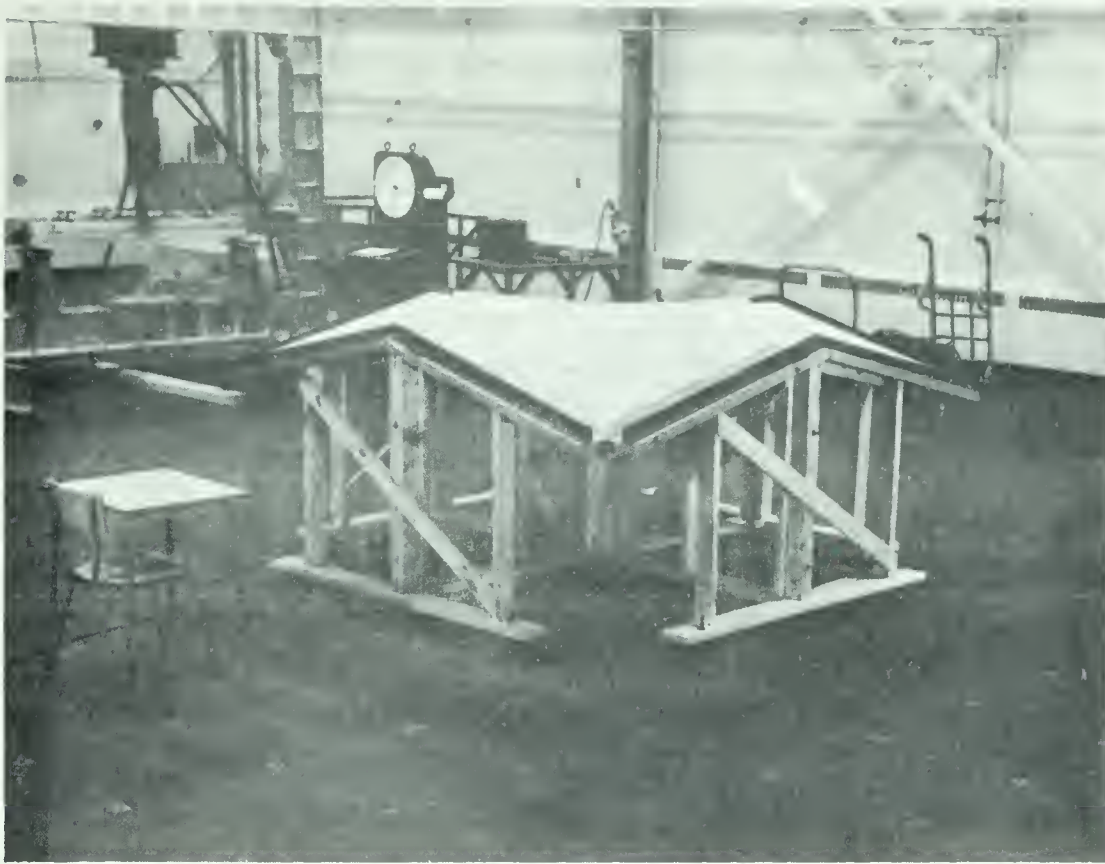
VIEW OF COMPLETED FORMWORK
